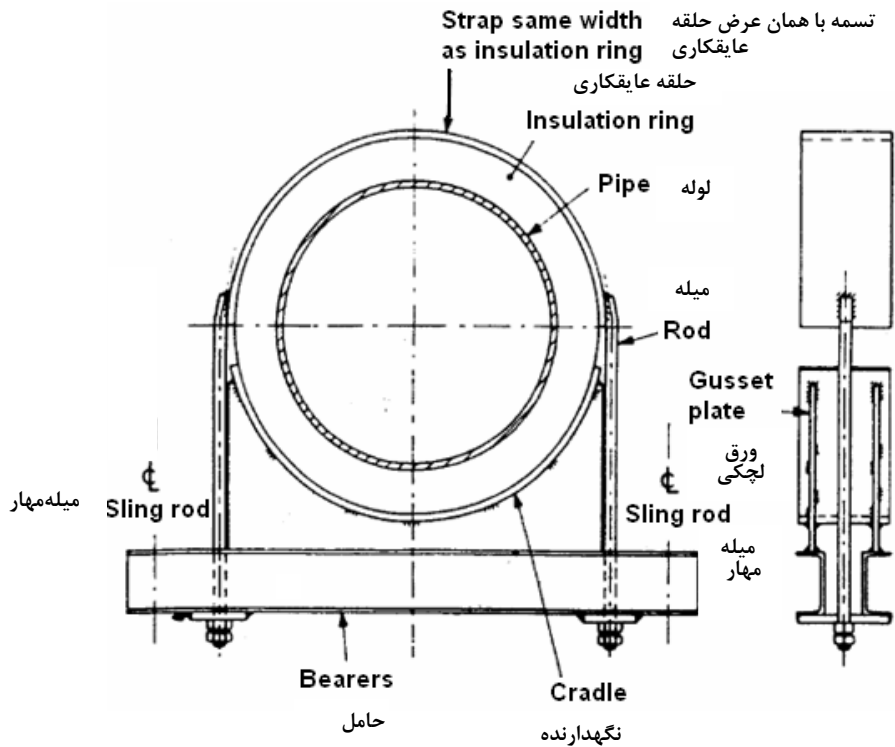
U-BOLT CRADLE USING INSULATION RING
